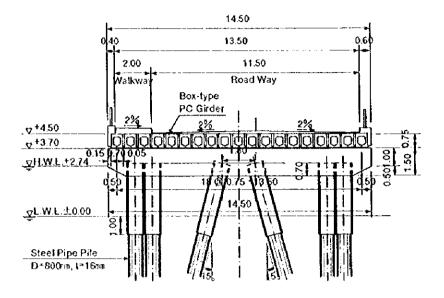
(4) Plan and Cross Section of Access Bridge of Surabaya.
